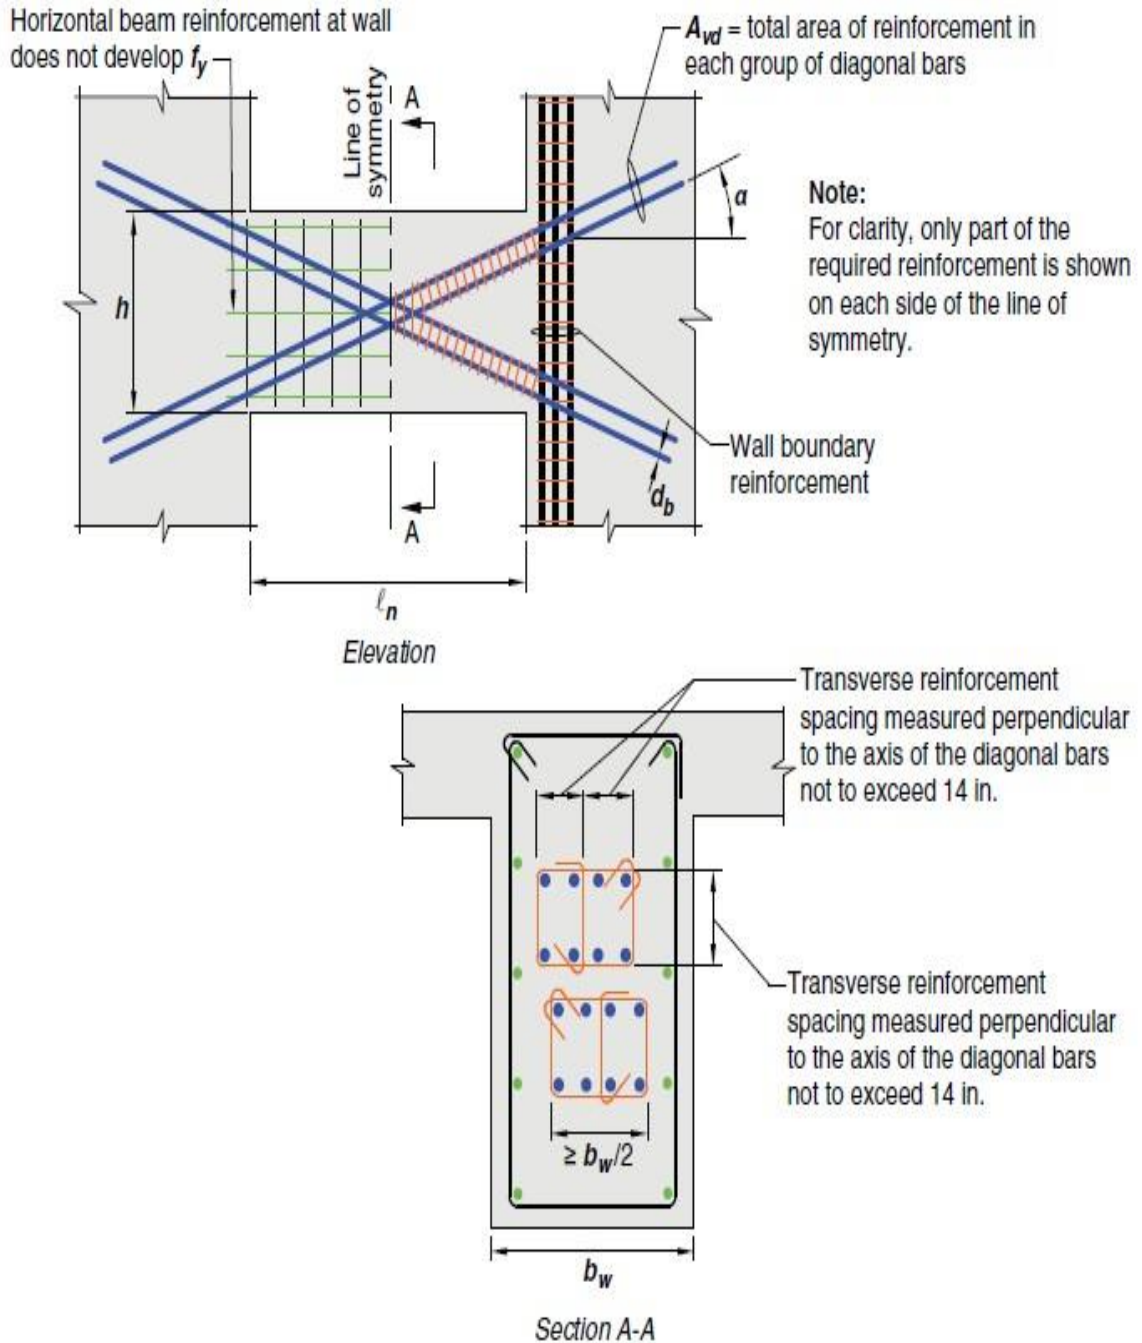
Confinement of individual diagonals in coupling beams with diagonally oriented reinforcement. Wall boundary reinforcement shown on one side only for clarity.
